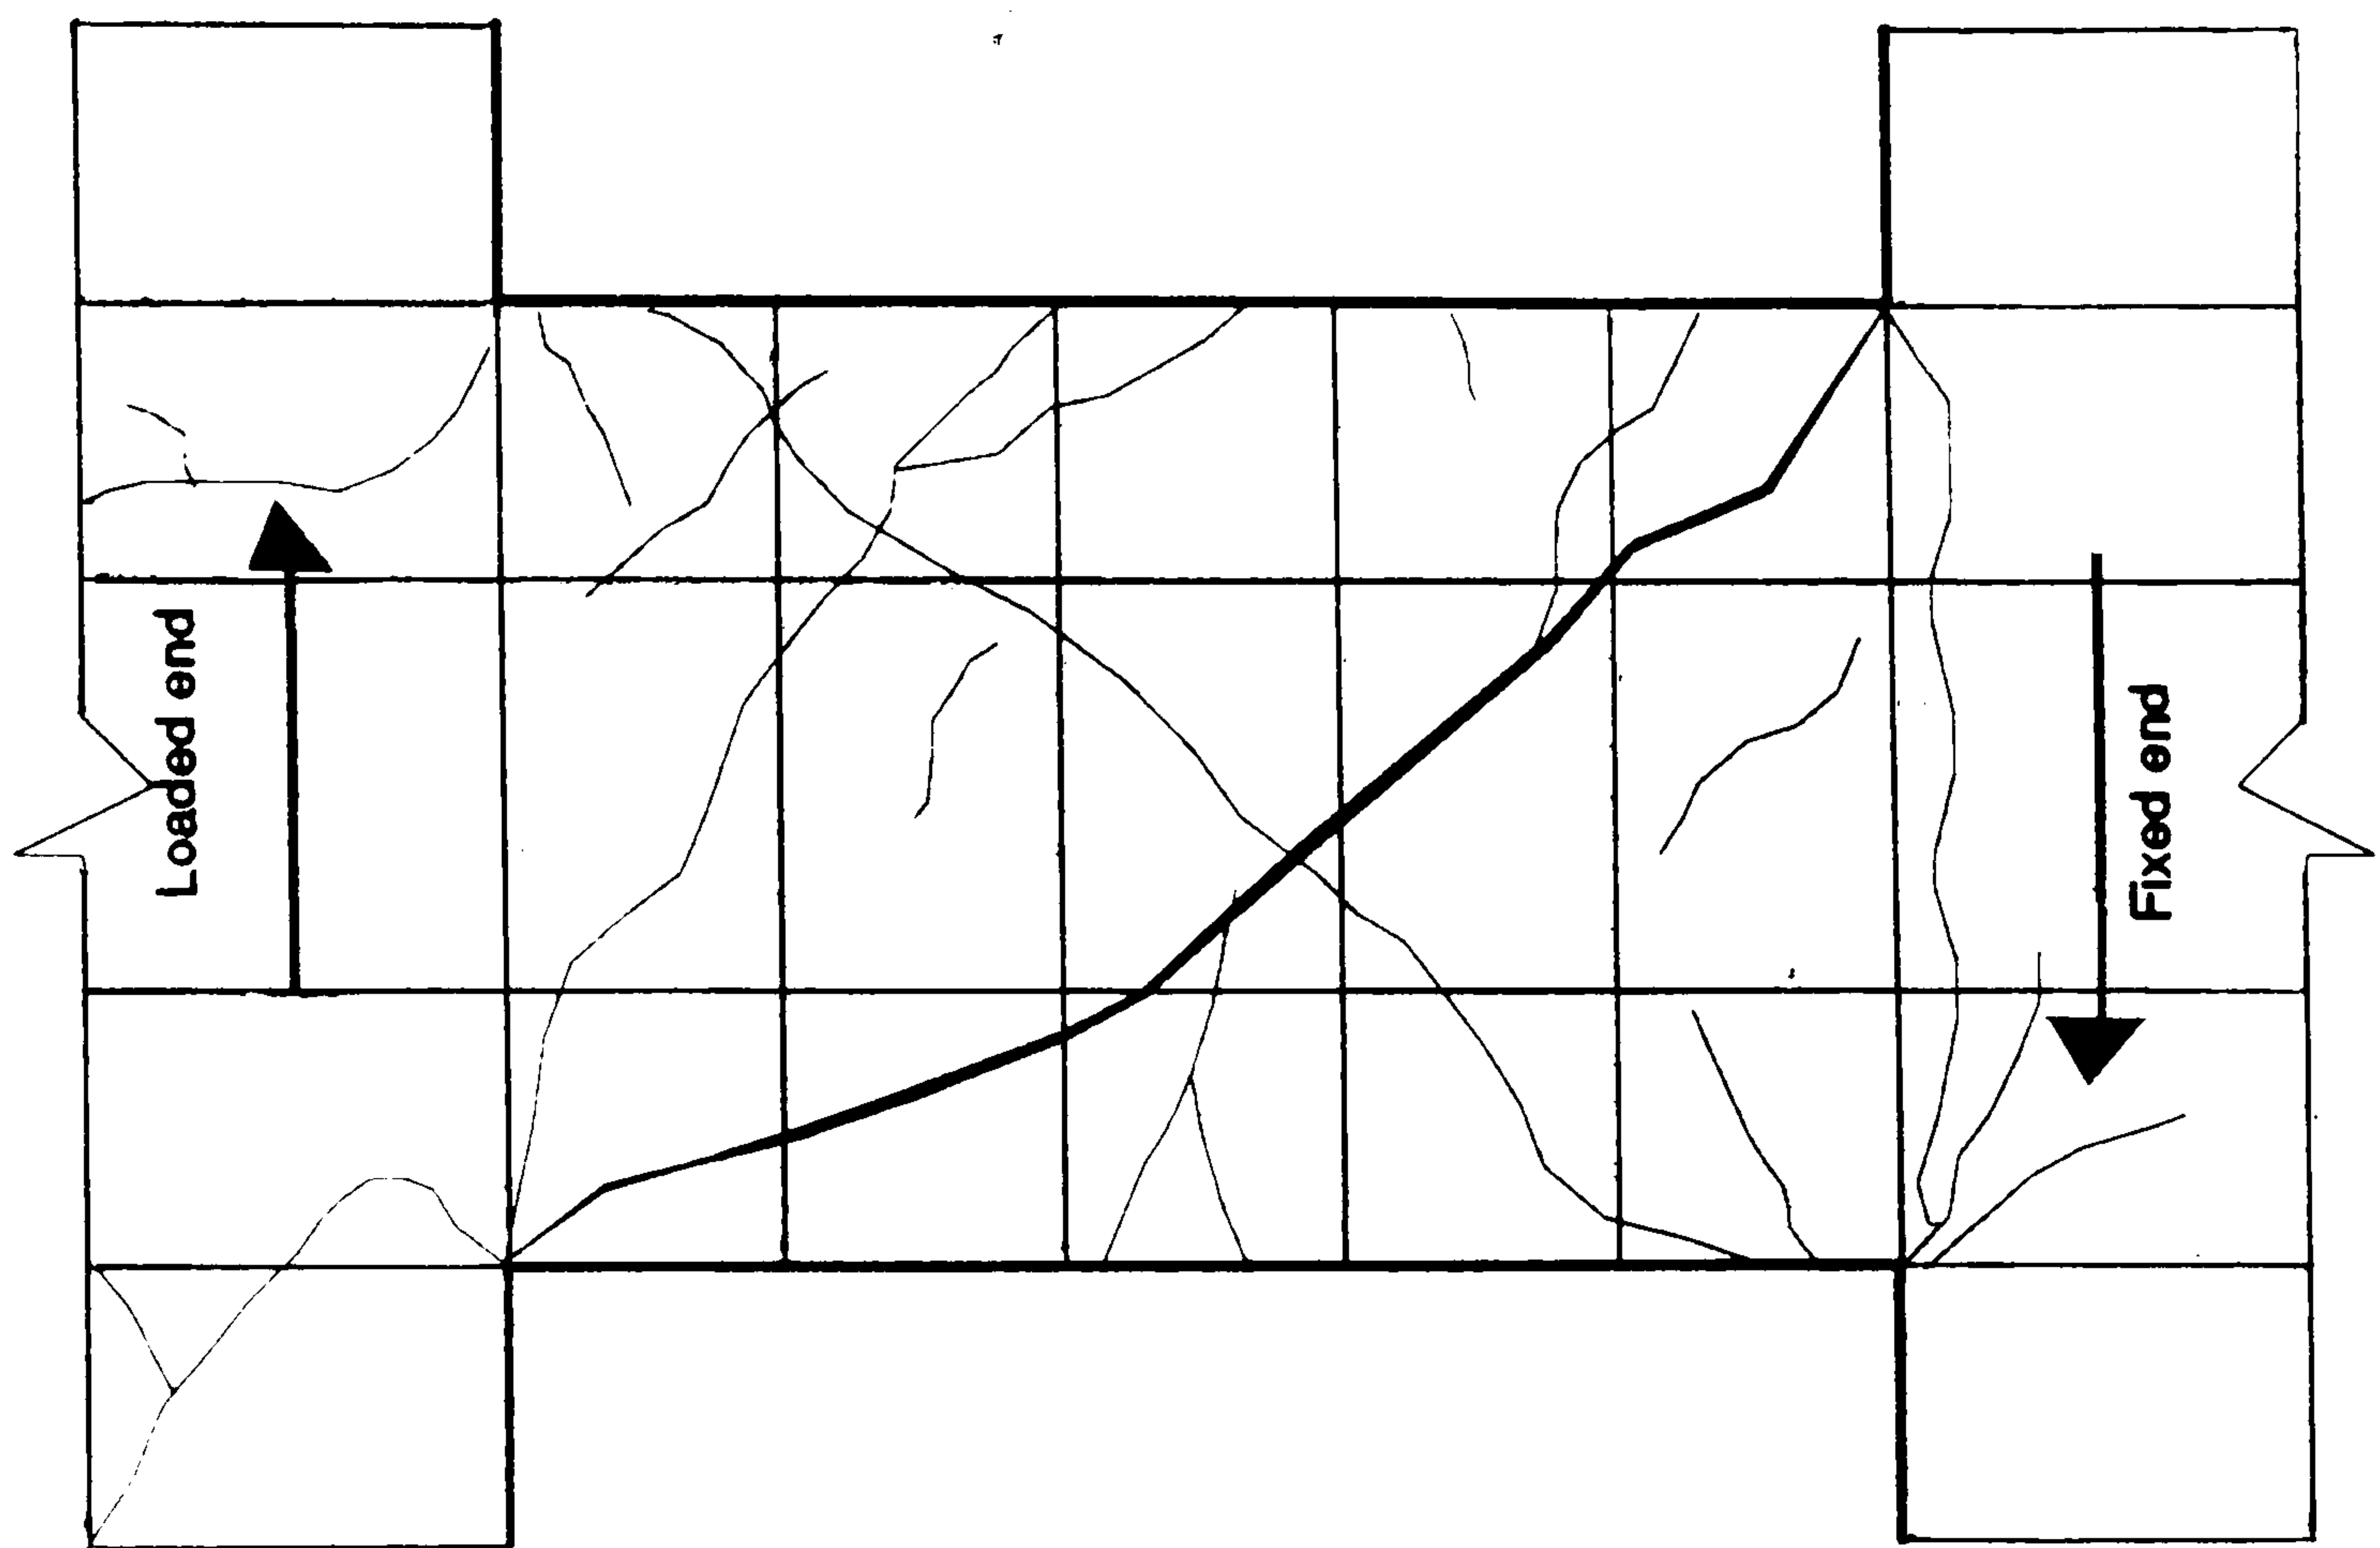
Failure mechanism and crack pattern for beam CBS1
